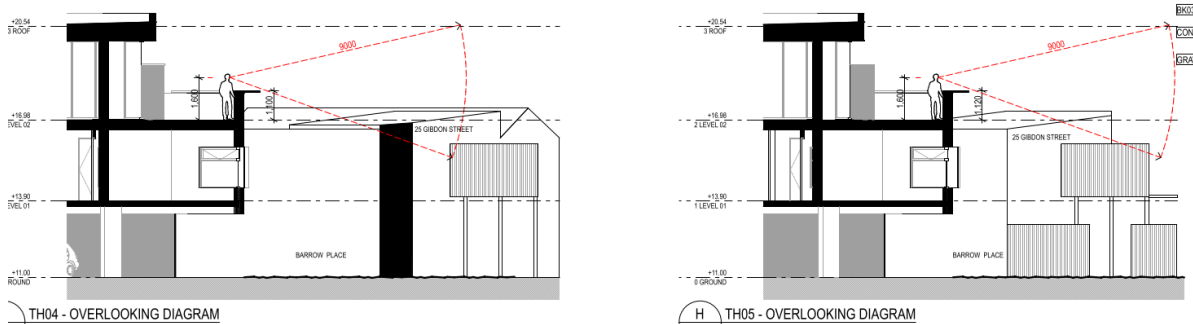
Sectional diagrams showing mitigation of overlooking from the second-floor terraces of dwellings TH04 (left) and TH05 (right).
